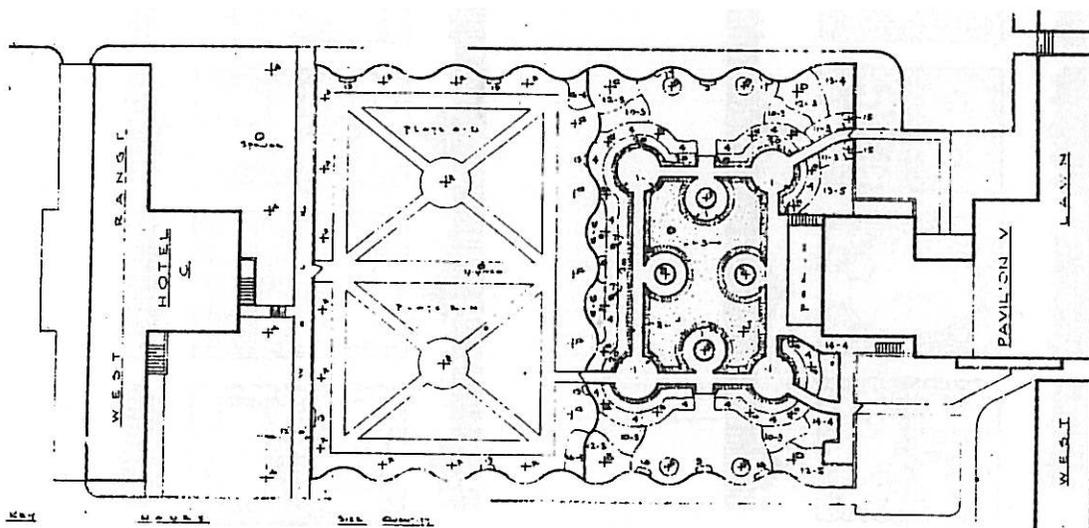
Planting Plan and Plant List, Pavilion V Garden July 1951 (Alden Hopkins, landscape architect)
